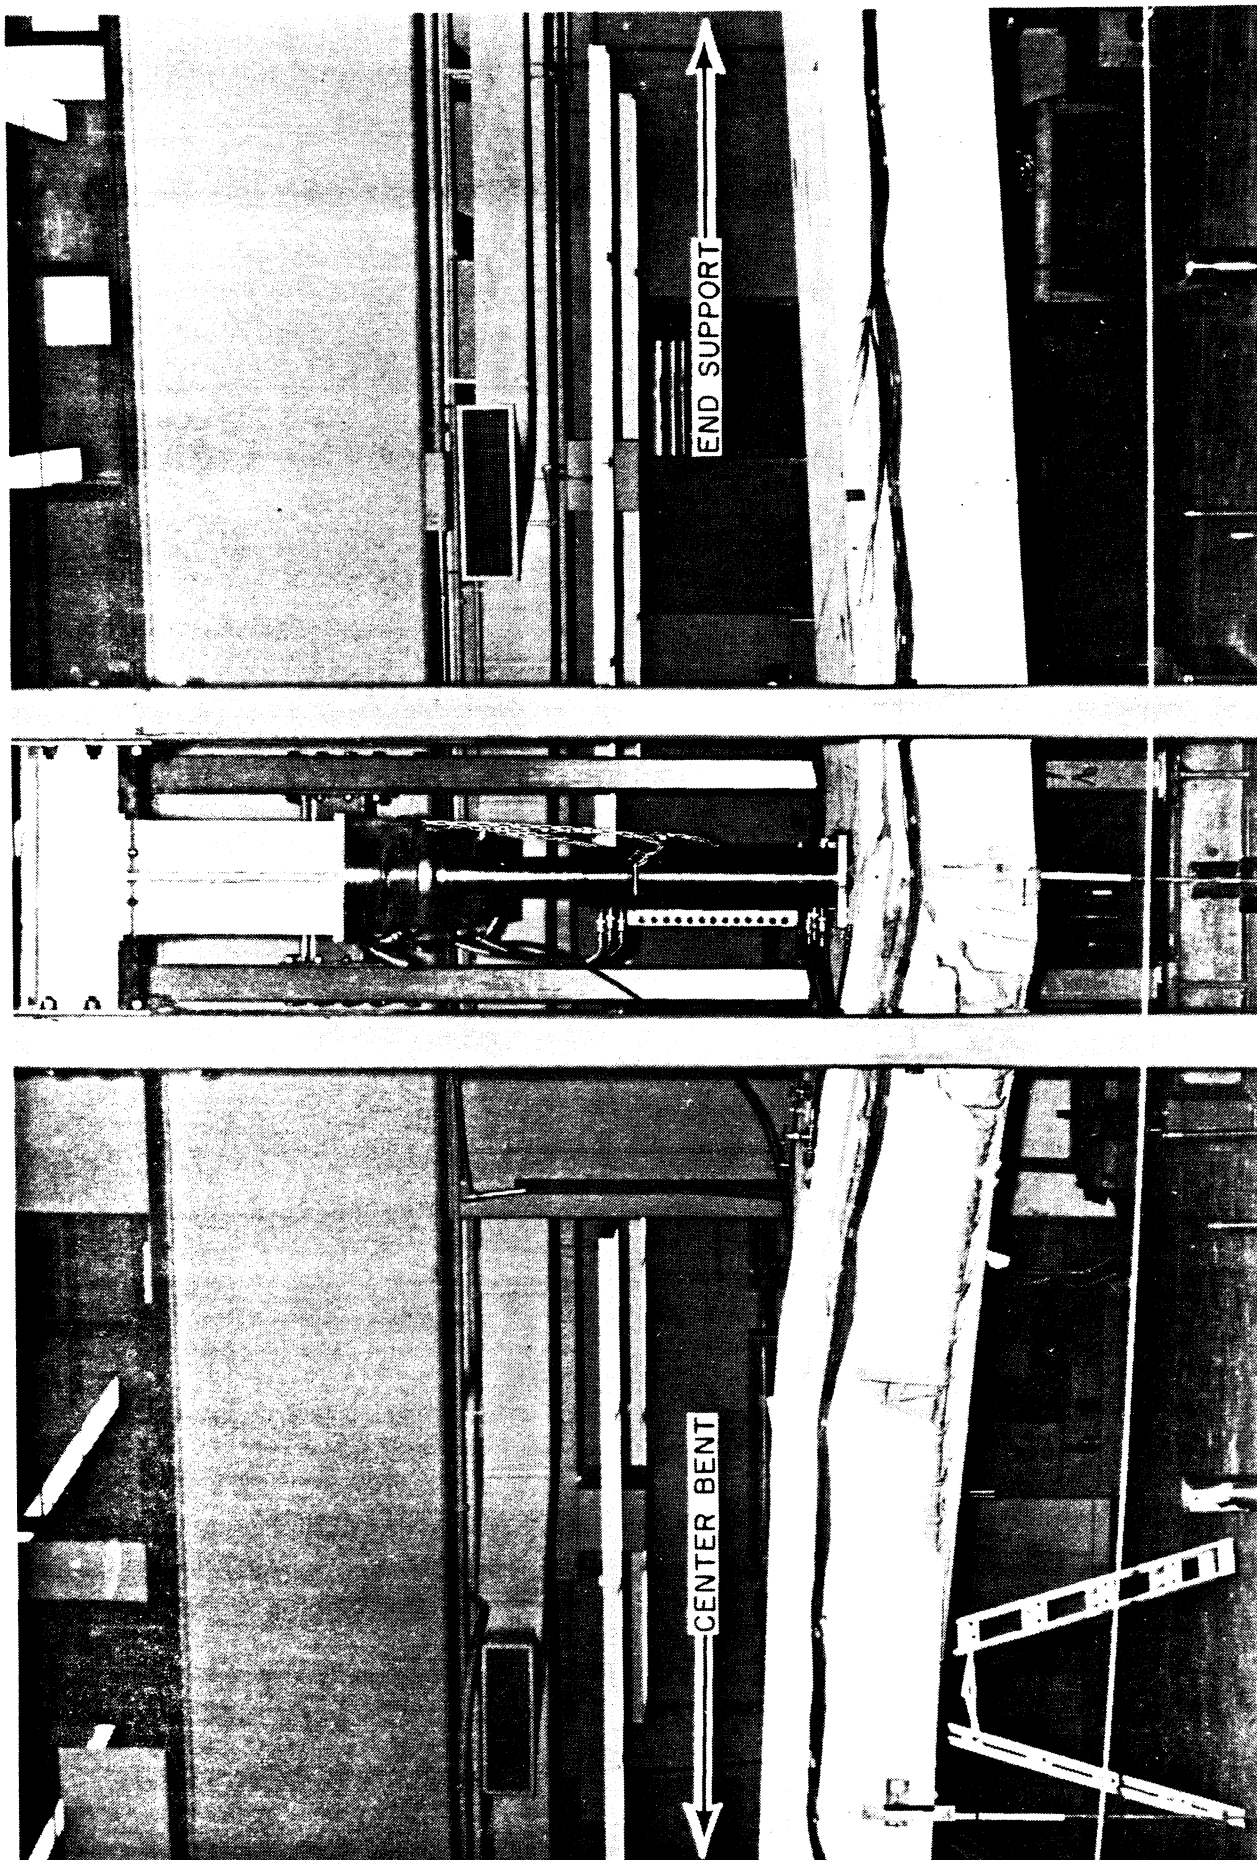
VIEW OF FAILURE ALONG OUTER GIRDER 5 OF DIAPHRAGMED SPAN I AT END OF THIRD LOADING CYCLE
